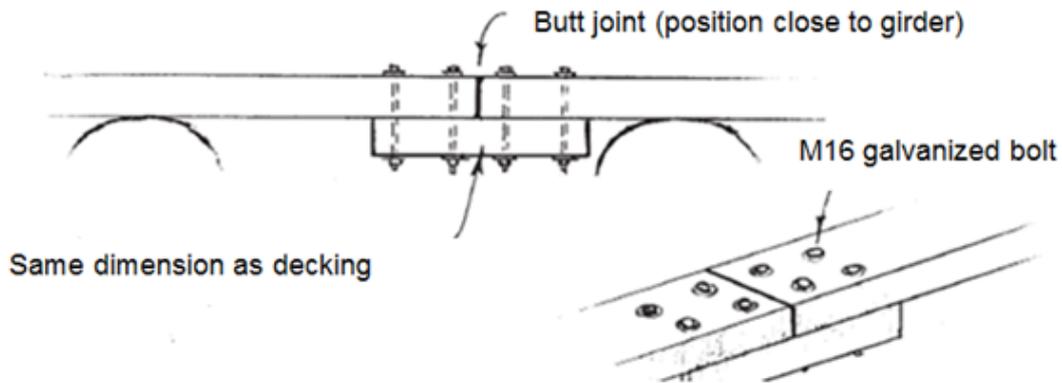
Splice detail (*Main Roads Queensland (2005)*)
